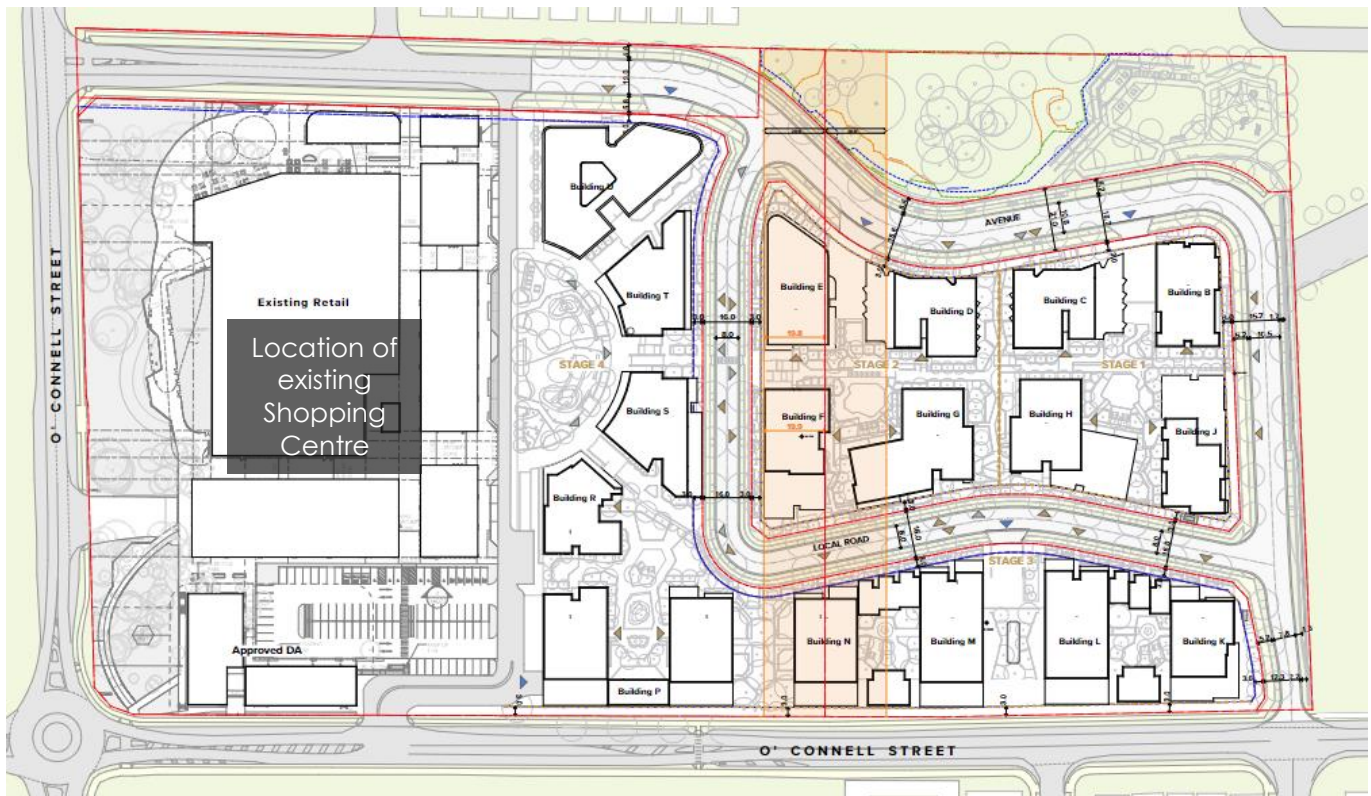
Extract of Site Plan, showing proposed precinct (Source: Turner, 2024)
